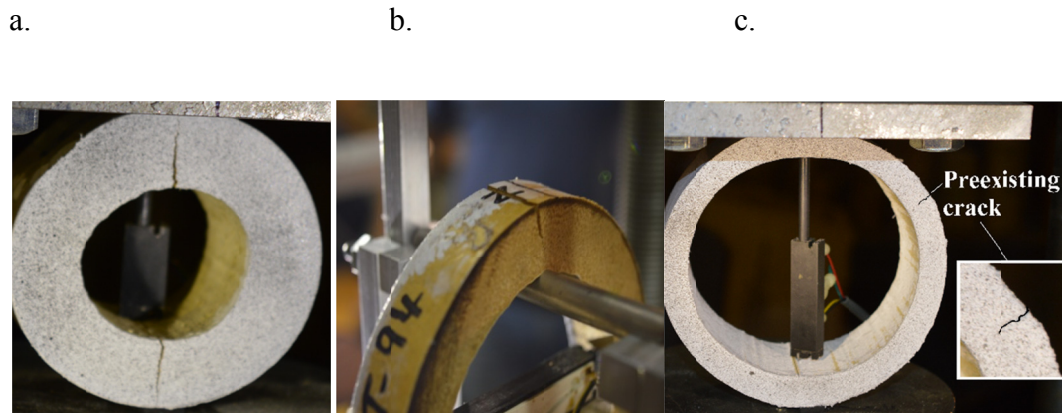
Failure types.a. Under compression load (T-14), b. Under tension load (T-94), c. Failure due to preexisting crack (G-44).
